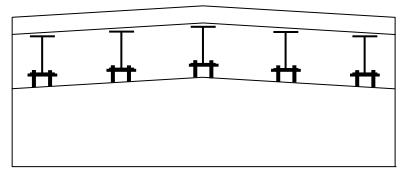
Cross Slope of Pile cap must match the cross slope of the deck.
